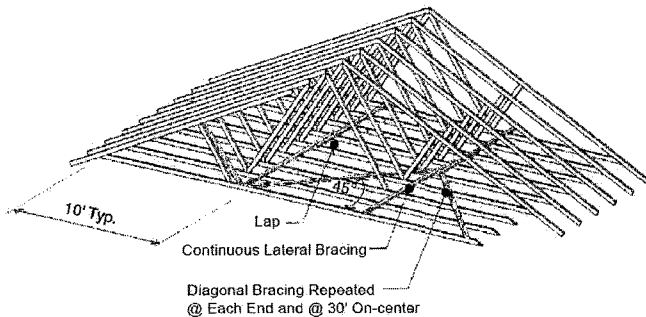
Bottom Chord and Web Bracing Detail (LGSEA 1998a)
